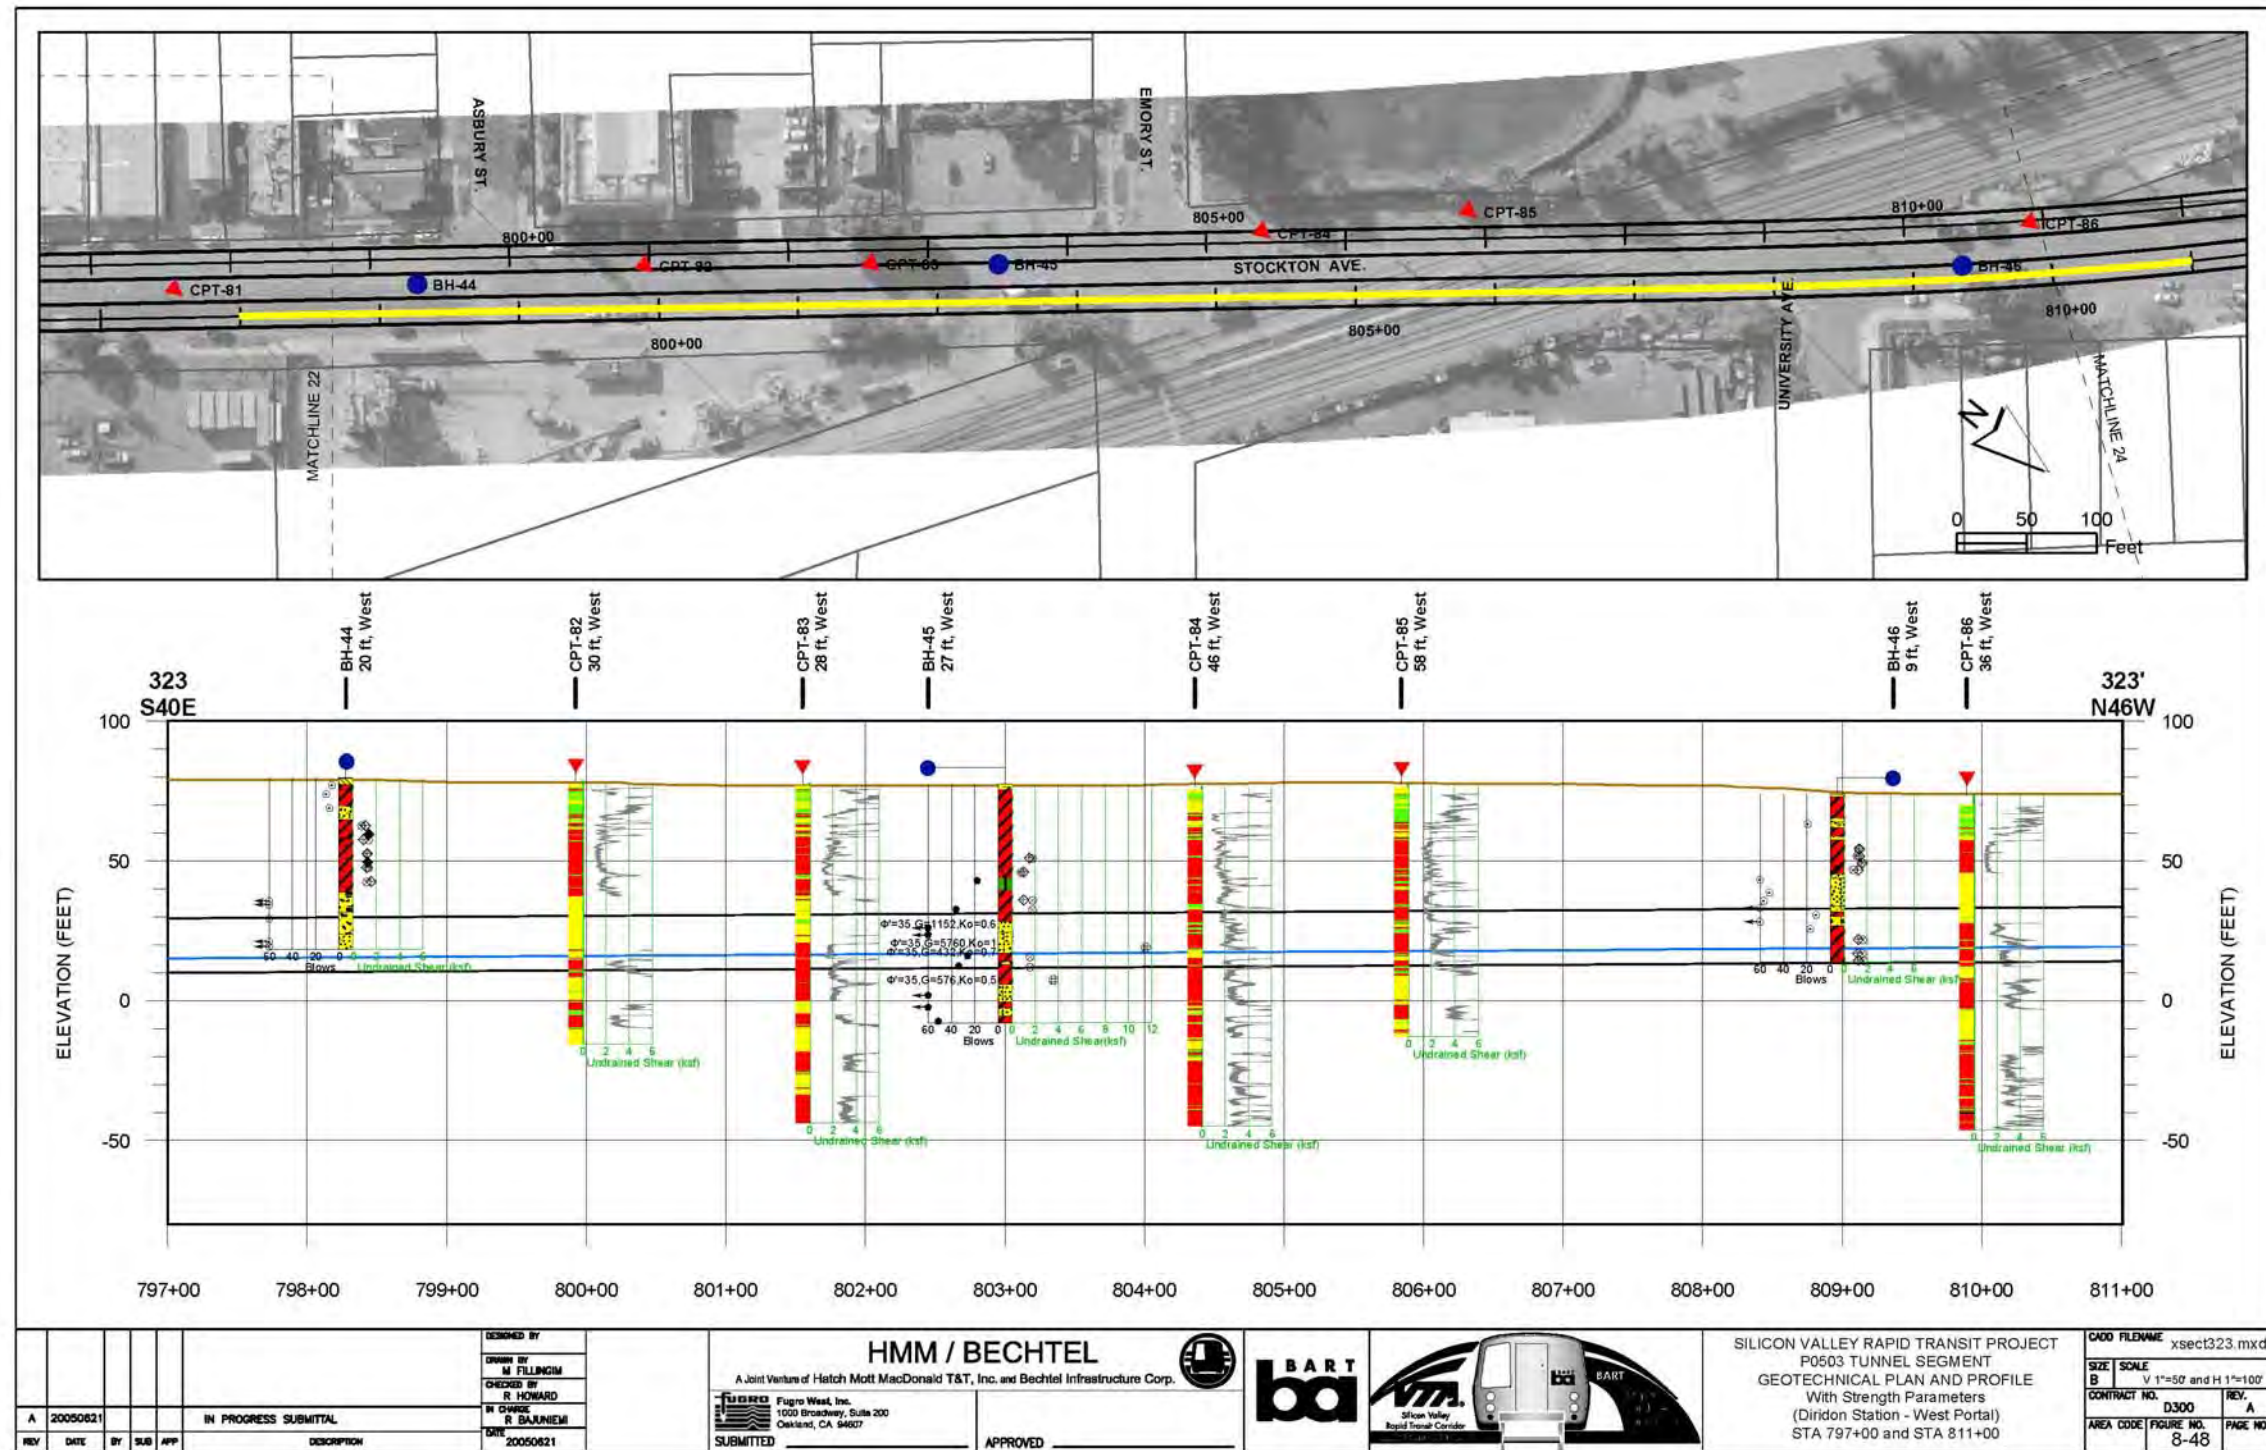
Geotechnical Plan and Profile with Strength Parameters: 797+00 to 811+00.
